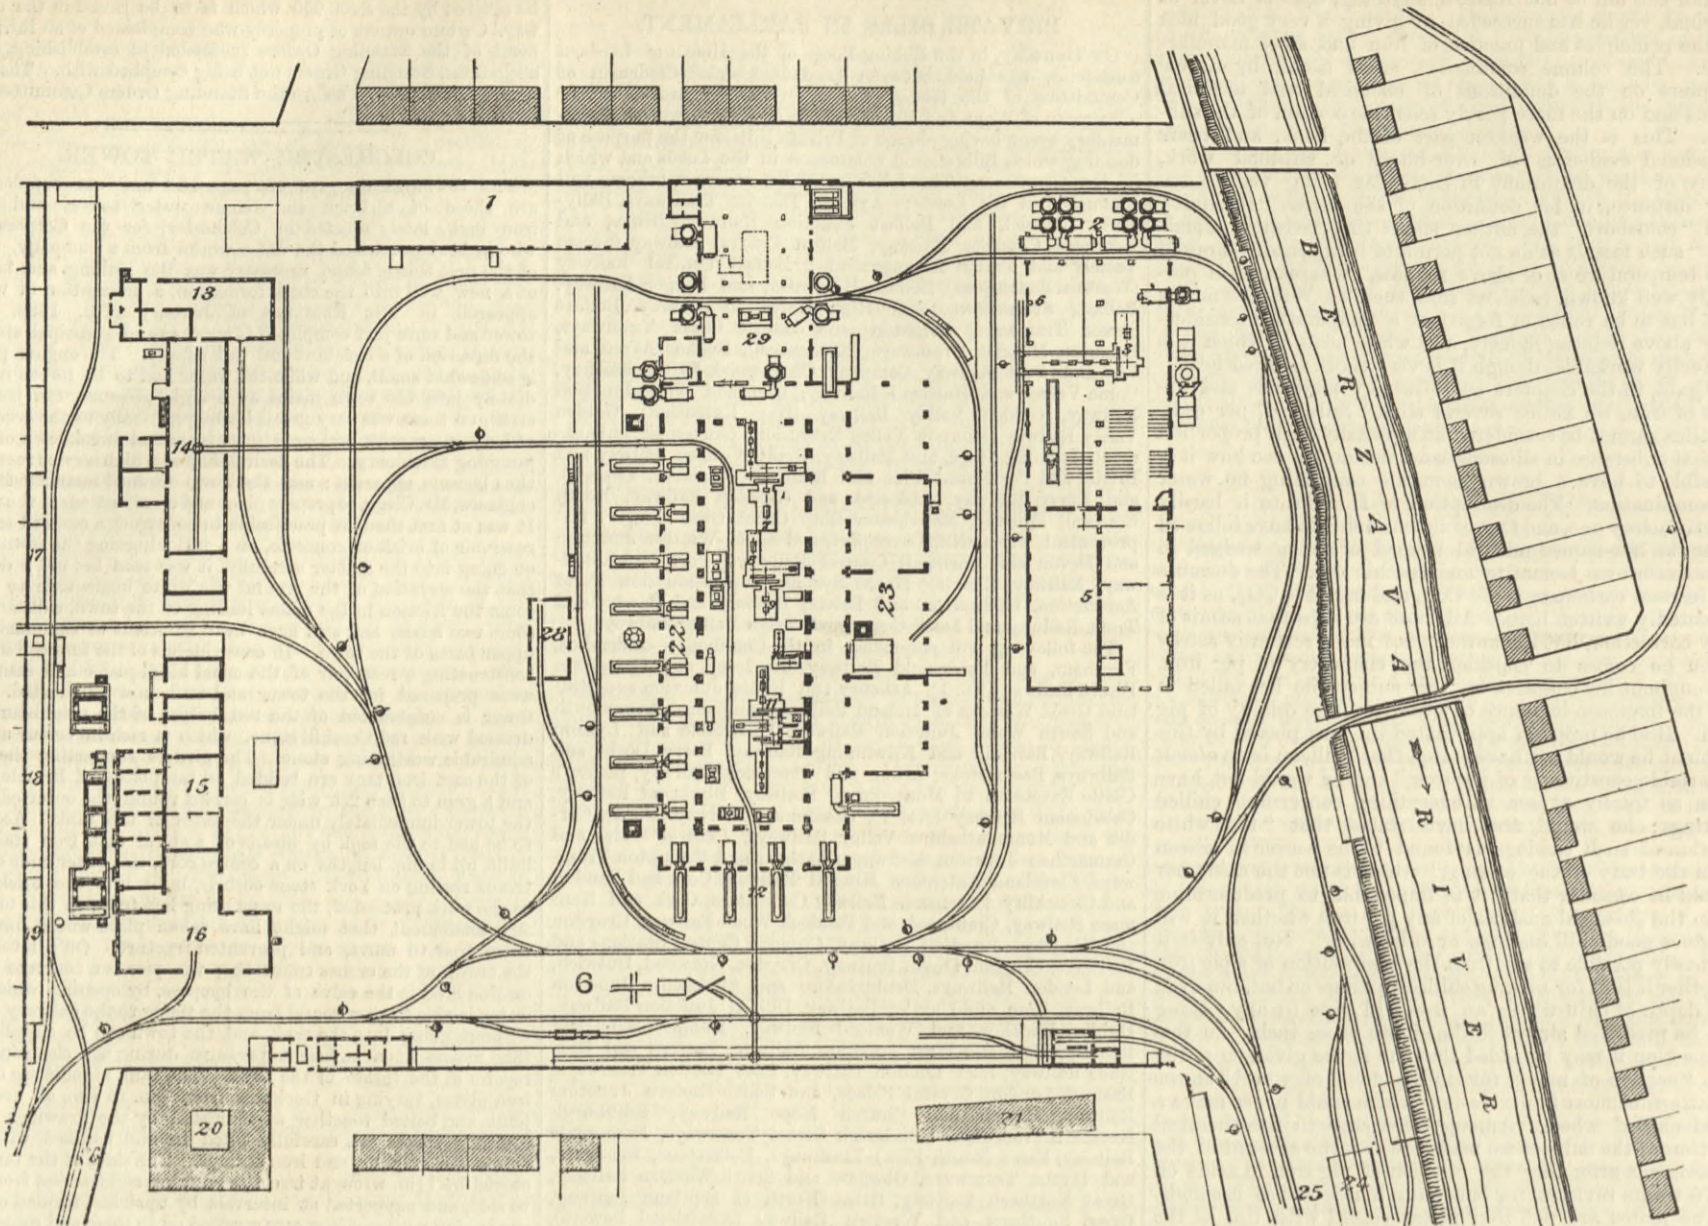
GROUND PLAN OF PUDDLING FURNACES, STEAM HAMMERS, ROLLING MILL, FIRE-BRICK WORKS, AND REPAIR SHOPS.
